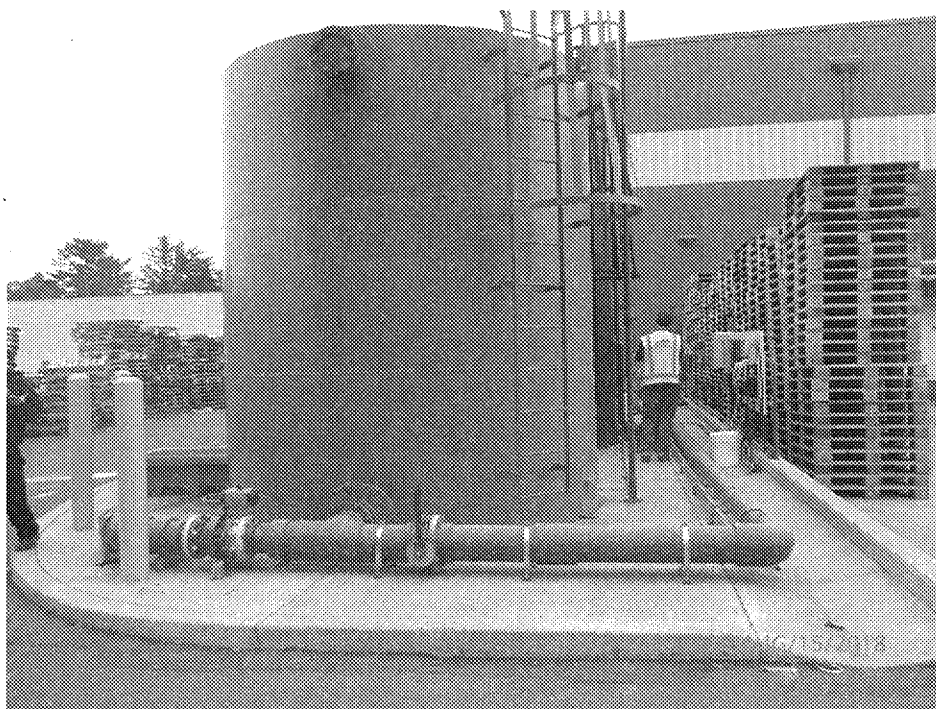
View of fermentation tanks located outside the facility's indoor brewing area. Water was observed on the ground underneath the tanks. The drains direct wastewater to the facility's pretreatment system.
